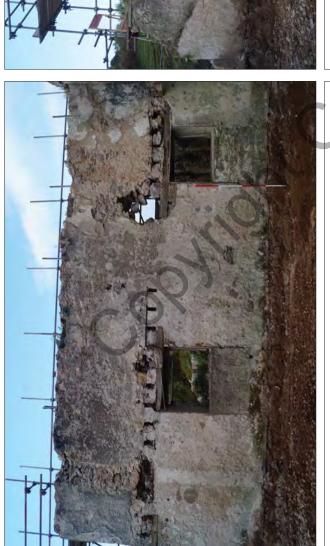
Barracks Cottage Interior - North-West Facing Elevation Following Clearance Works
